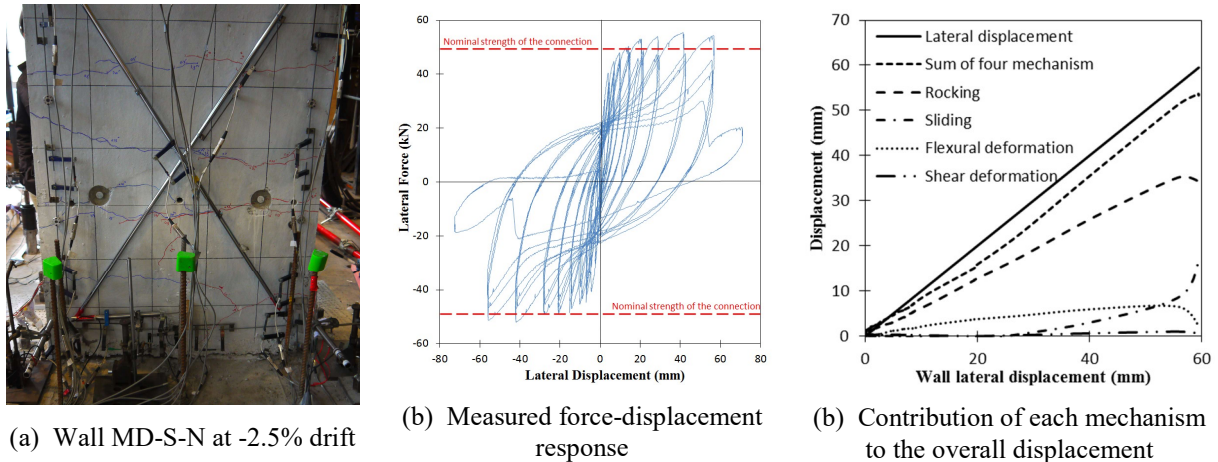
Results of in-plane test of grouted metal duct connection with no stirrups
